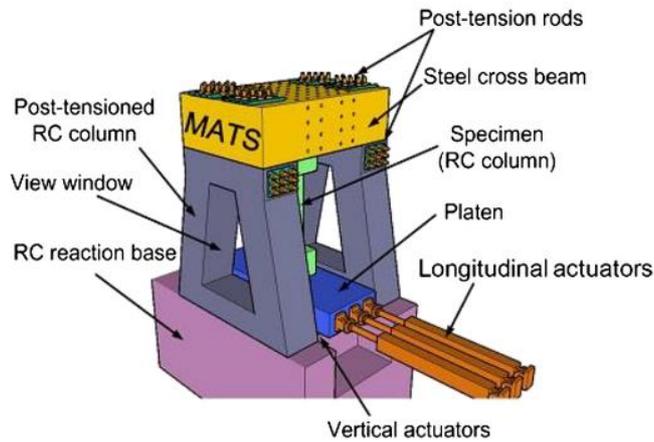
Test setup of RC column at the multi-axial testing system (MATS)[4] in NCREE.
